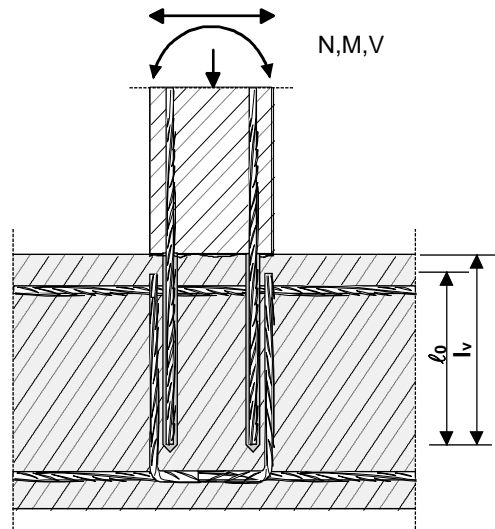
Overlap joint at a foundation of a column or wall where the rebars are stressed in tension
